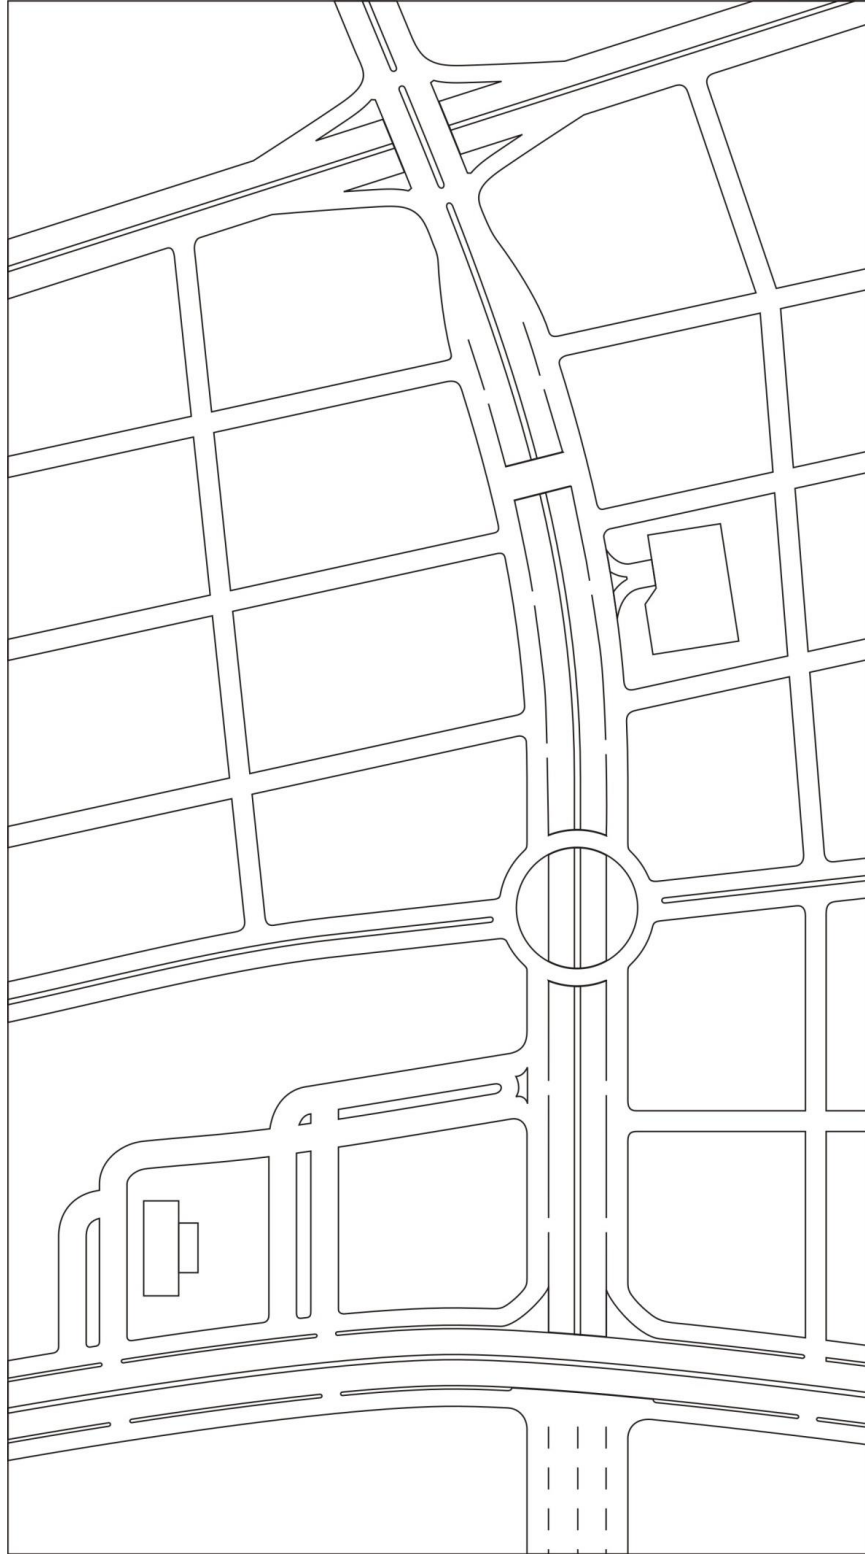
Geometrical design of proposition 3 (tunnel, tunnel/roundabout & bridge)
